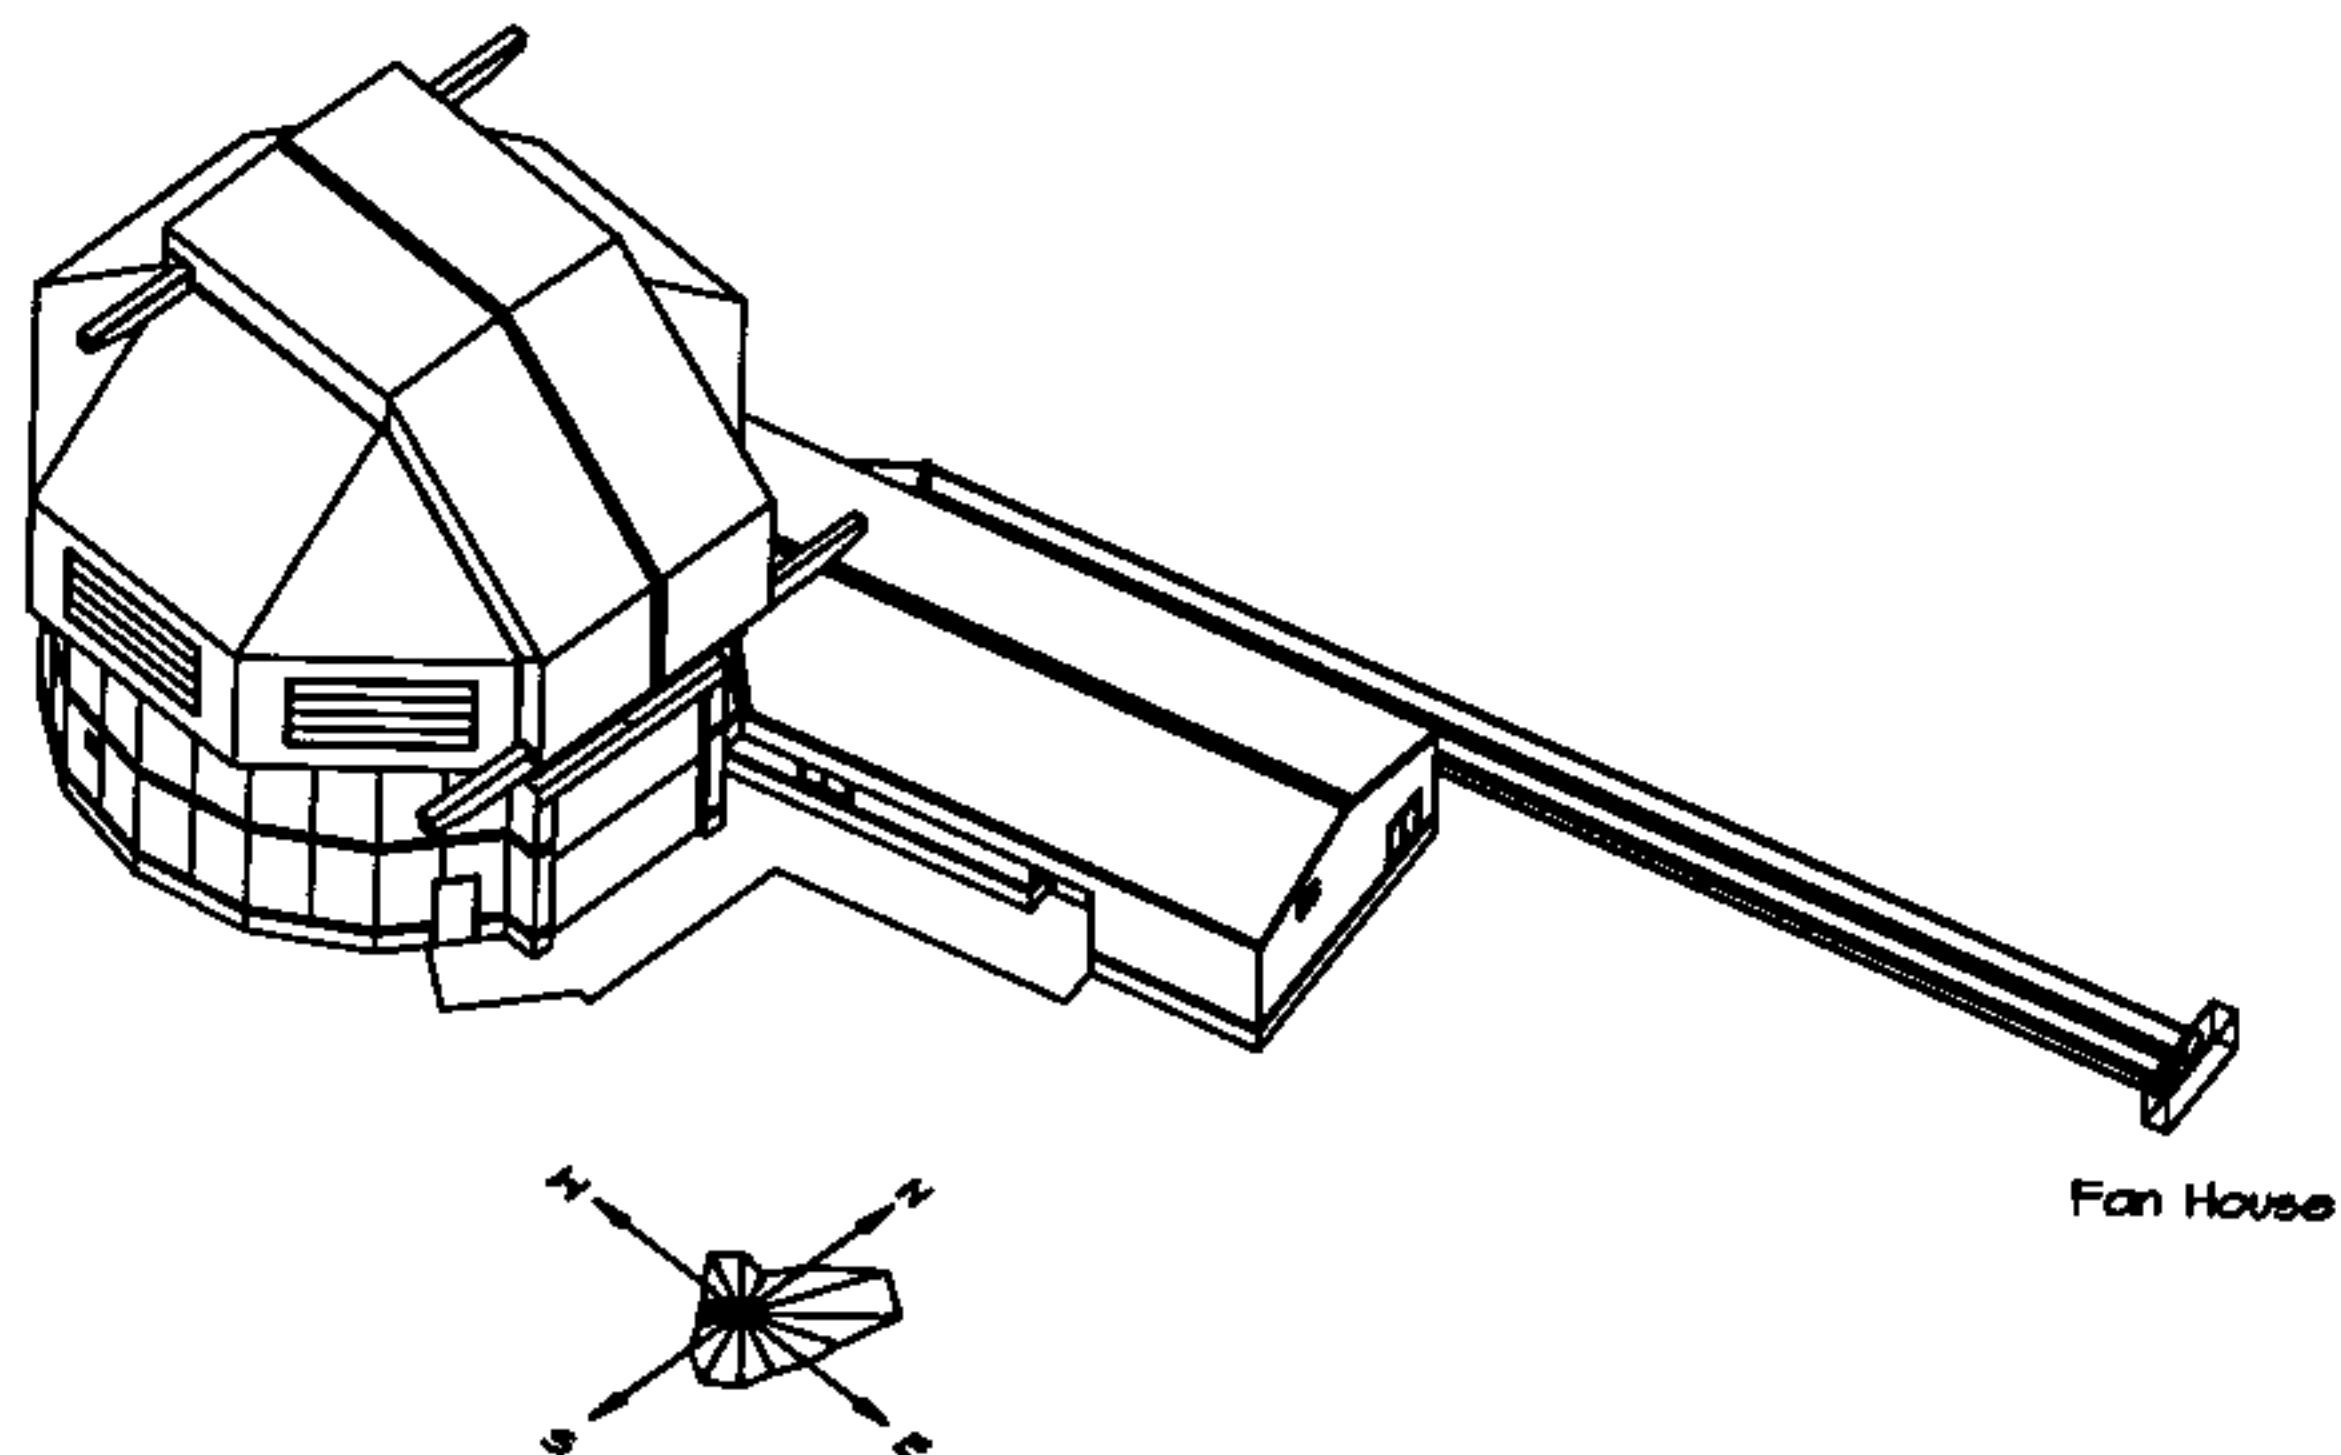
Quartering view of the facility showing the polyhedral dome, control building, ventilation ducts and fan house. The compass rose shows the prevailing winds.
